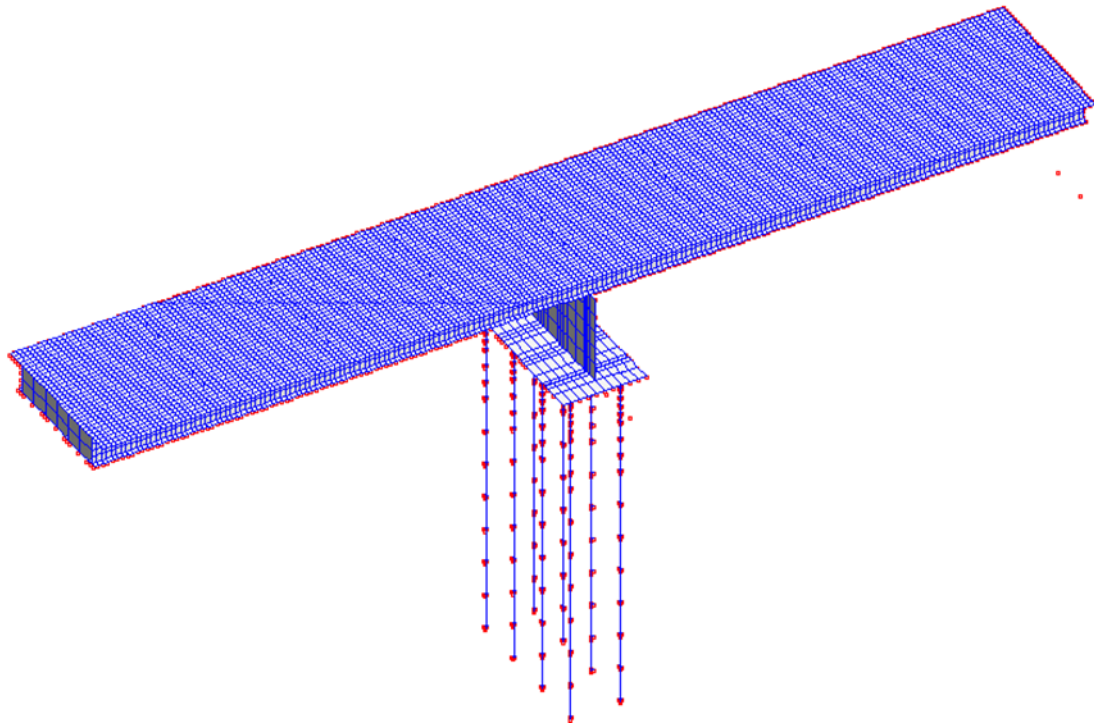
FEM Model of two spans resting on a pier founded on piled foundation
